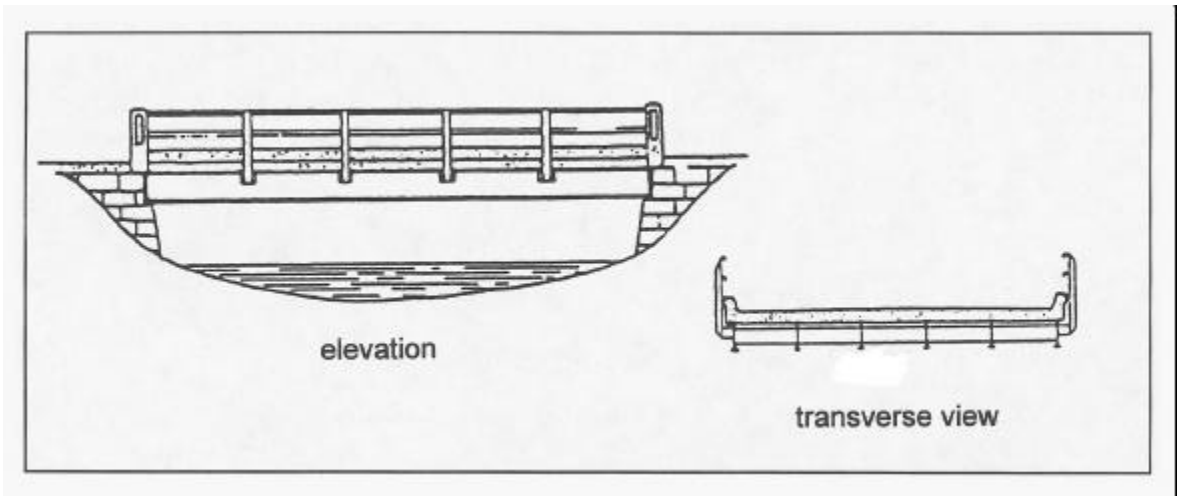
Steel beam, elevation and transverse view (Source: Carver N.D.).
